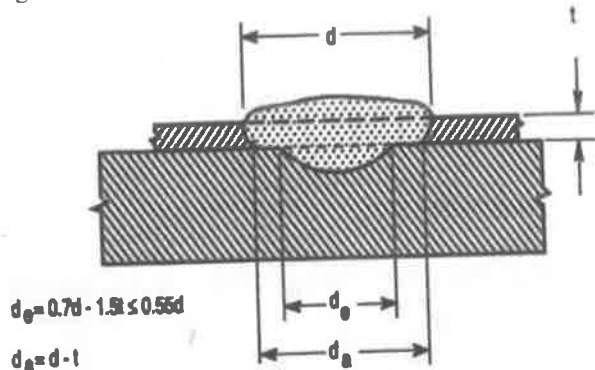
Arc Spot Weld – Double Thickness of Sheet
